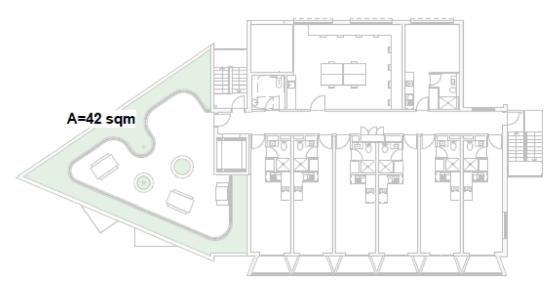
Level 5 Plan - showing areas of landscaping included by the applicant (Source: Applicant)
